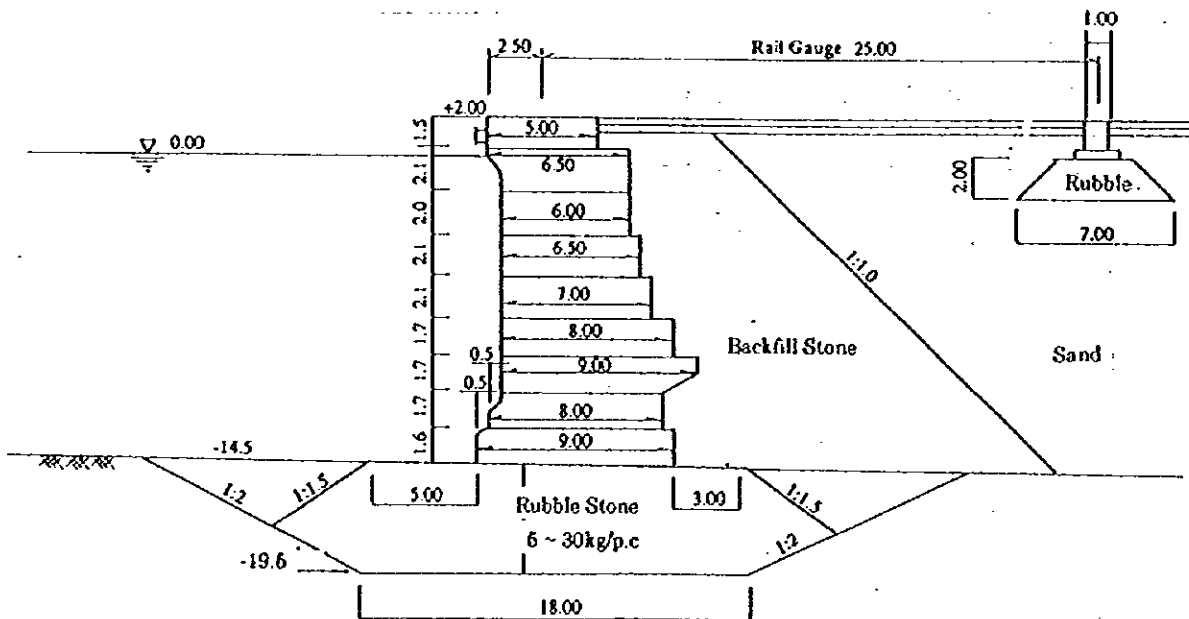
Typical Cross Section of (-)14 m Container Berth
